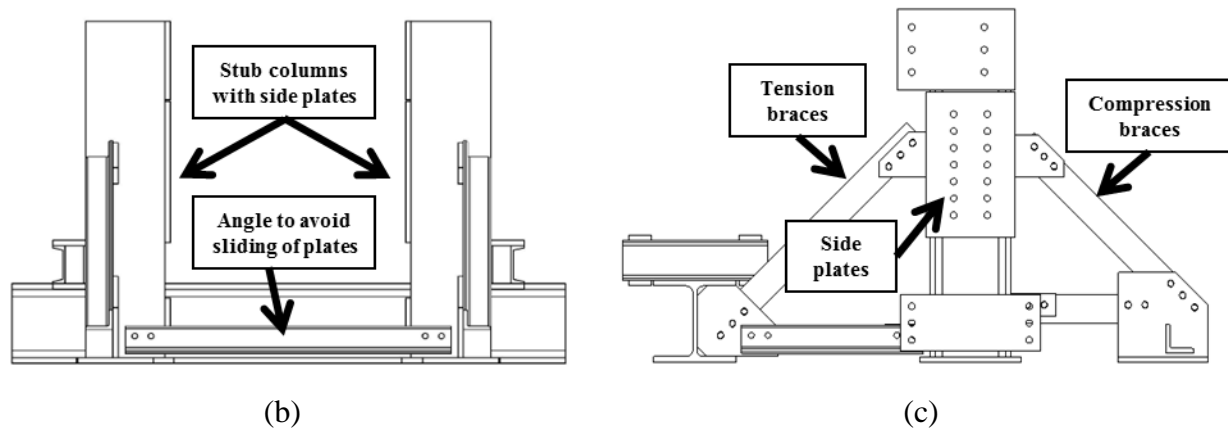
(continued) – Reaction frame: (a) plan view; (b) elevation A-A; (c) elevation B-B
